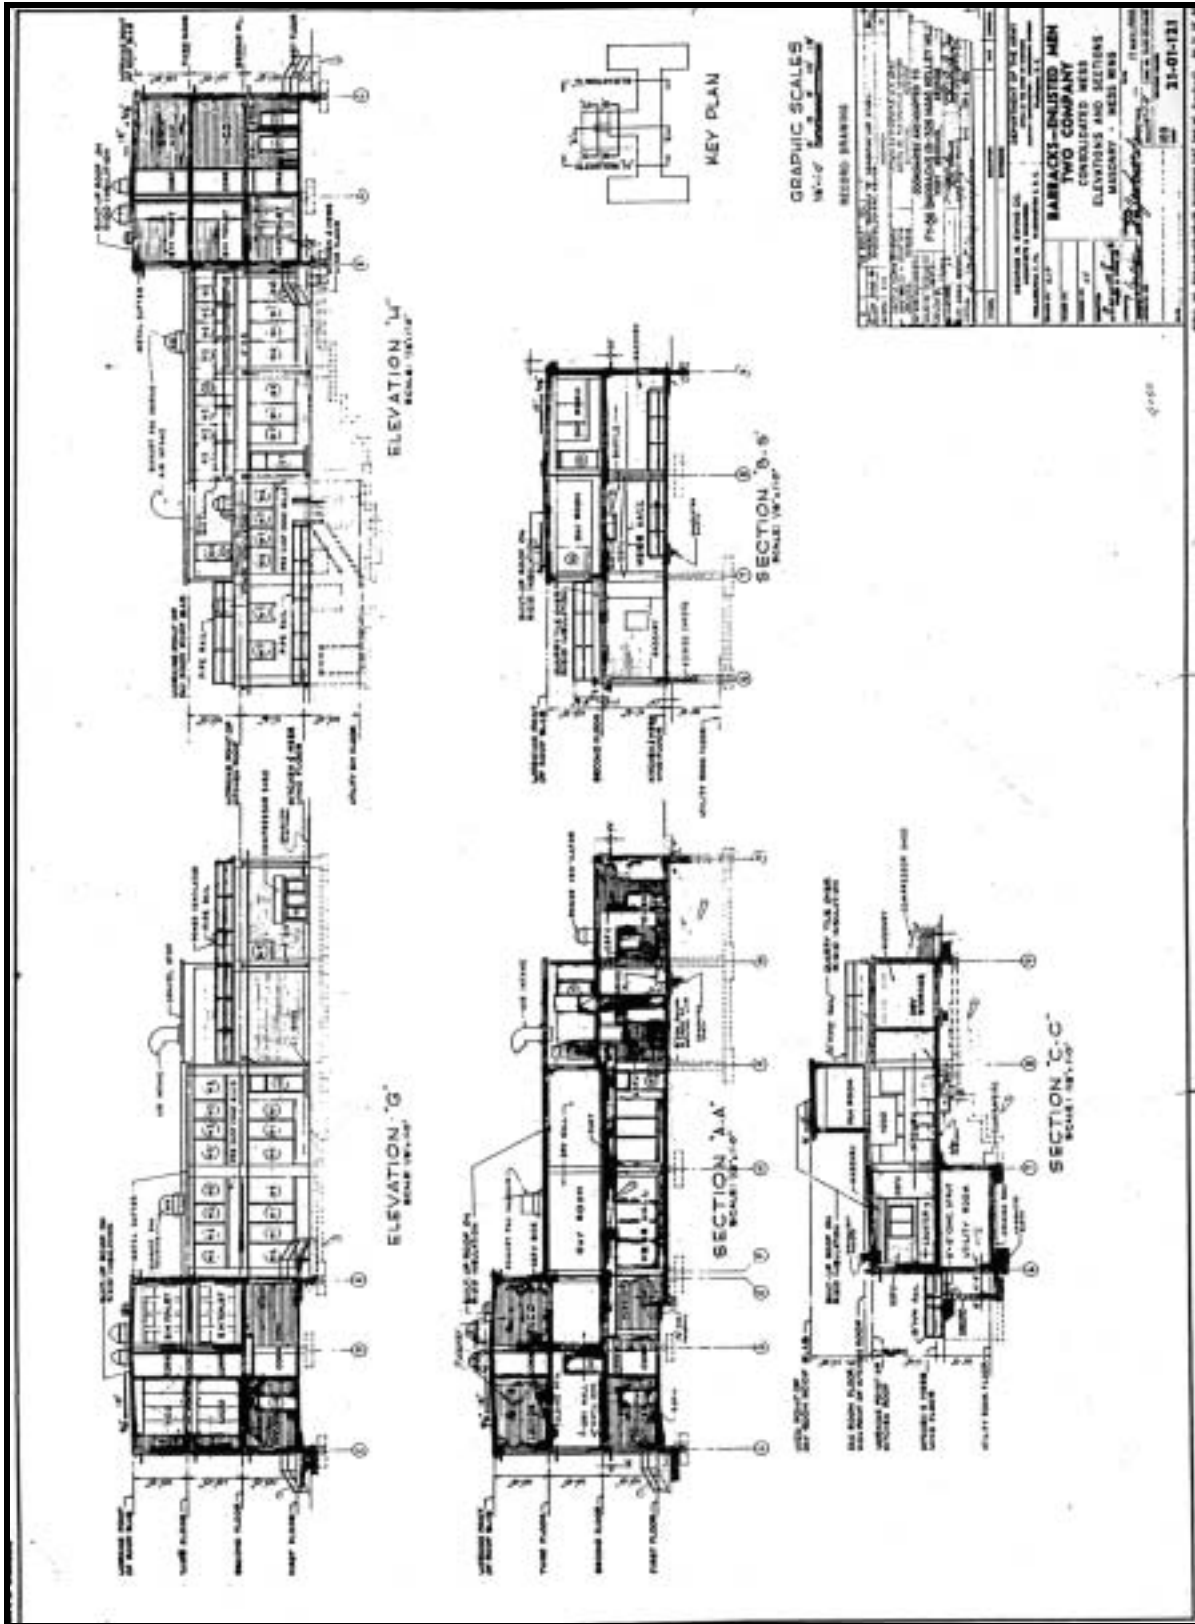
H-style, two-company barracks, consolidated mess, elevations and sections (ca. 1955, revised 1958) (Engineering, Ft. Benning).
